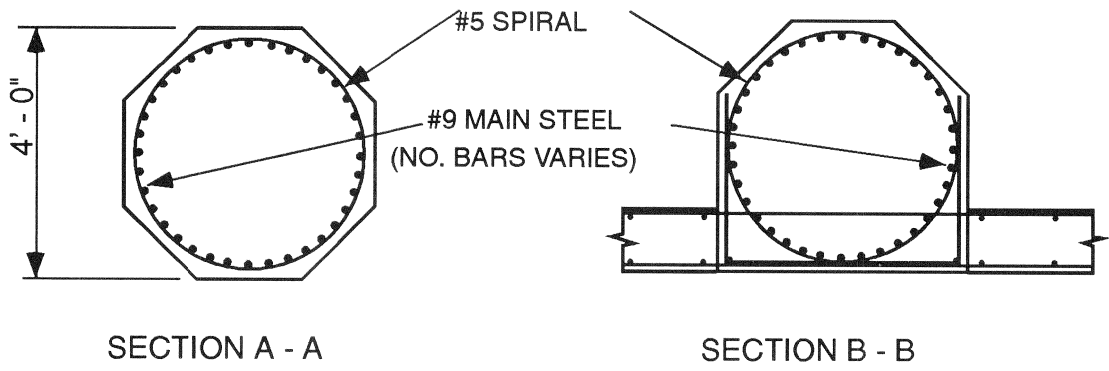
Bull Creek Canyon Channel Bridge -
